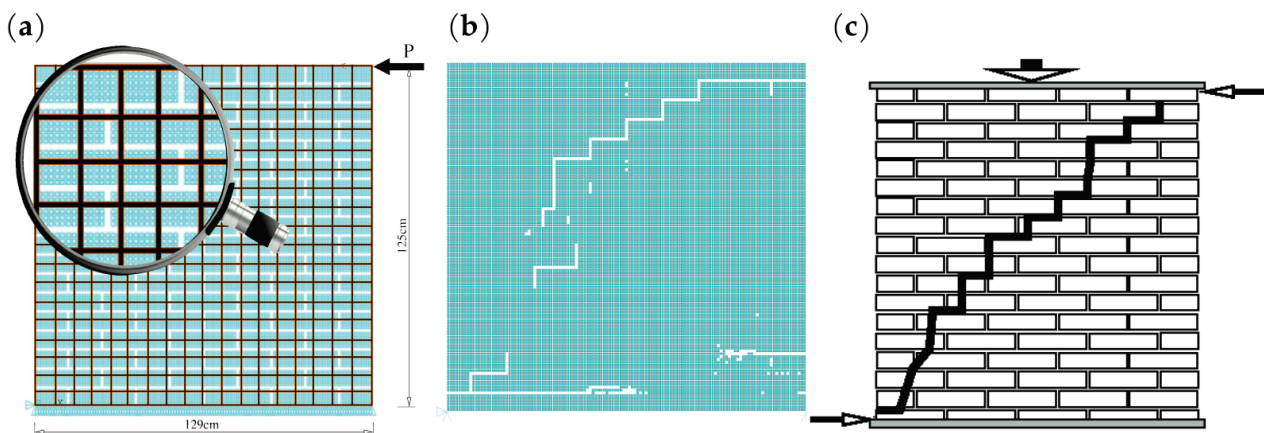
Shear wall: (a) model discretisation; (b) damage propagation pattern according to the adopted algorithm; (c) a form of typical failure mechanism in masonry under shear and compression.
